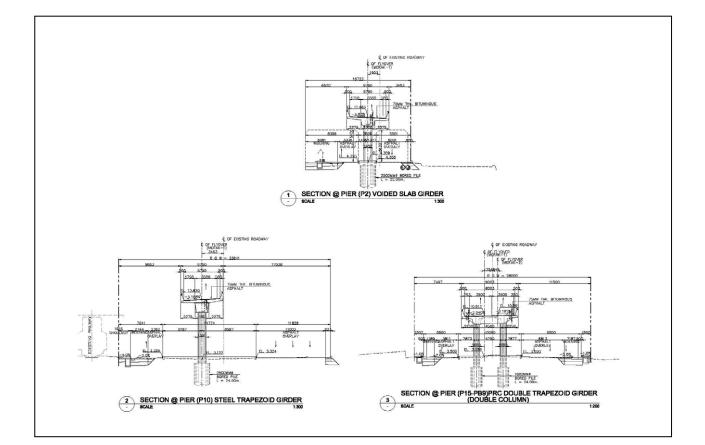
TYPICAL CROSS SECTION (MERAK)
